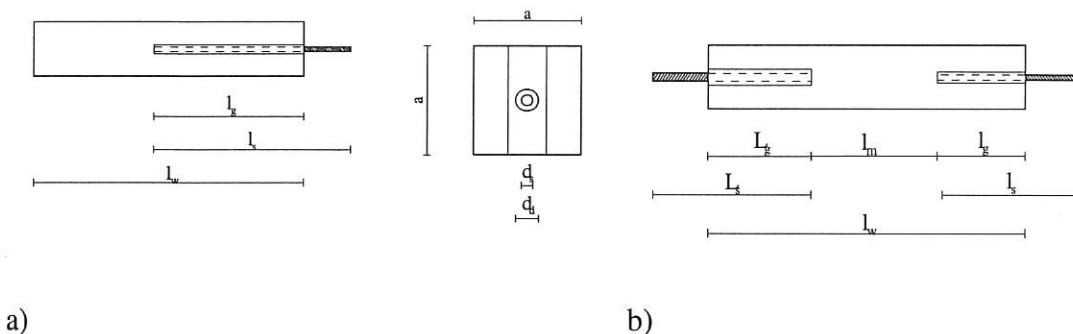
Design of test specimens a) Type A, b) Type B.
